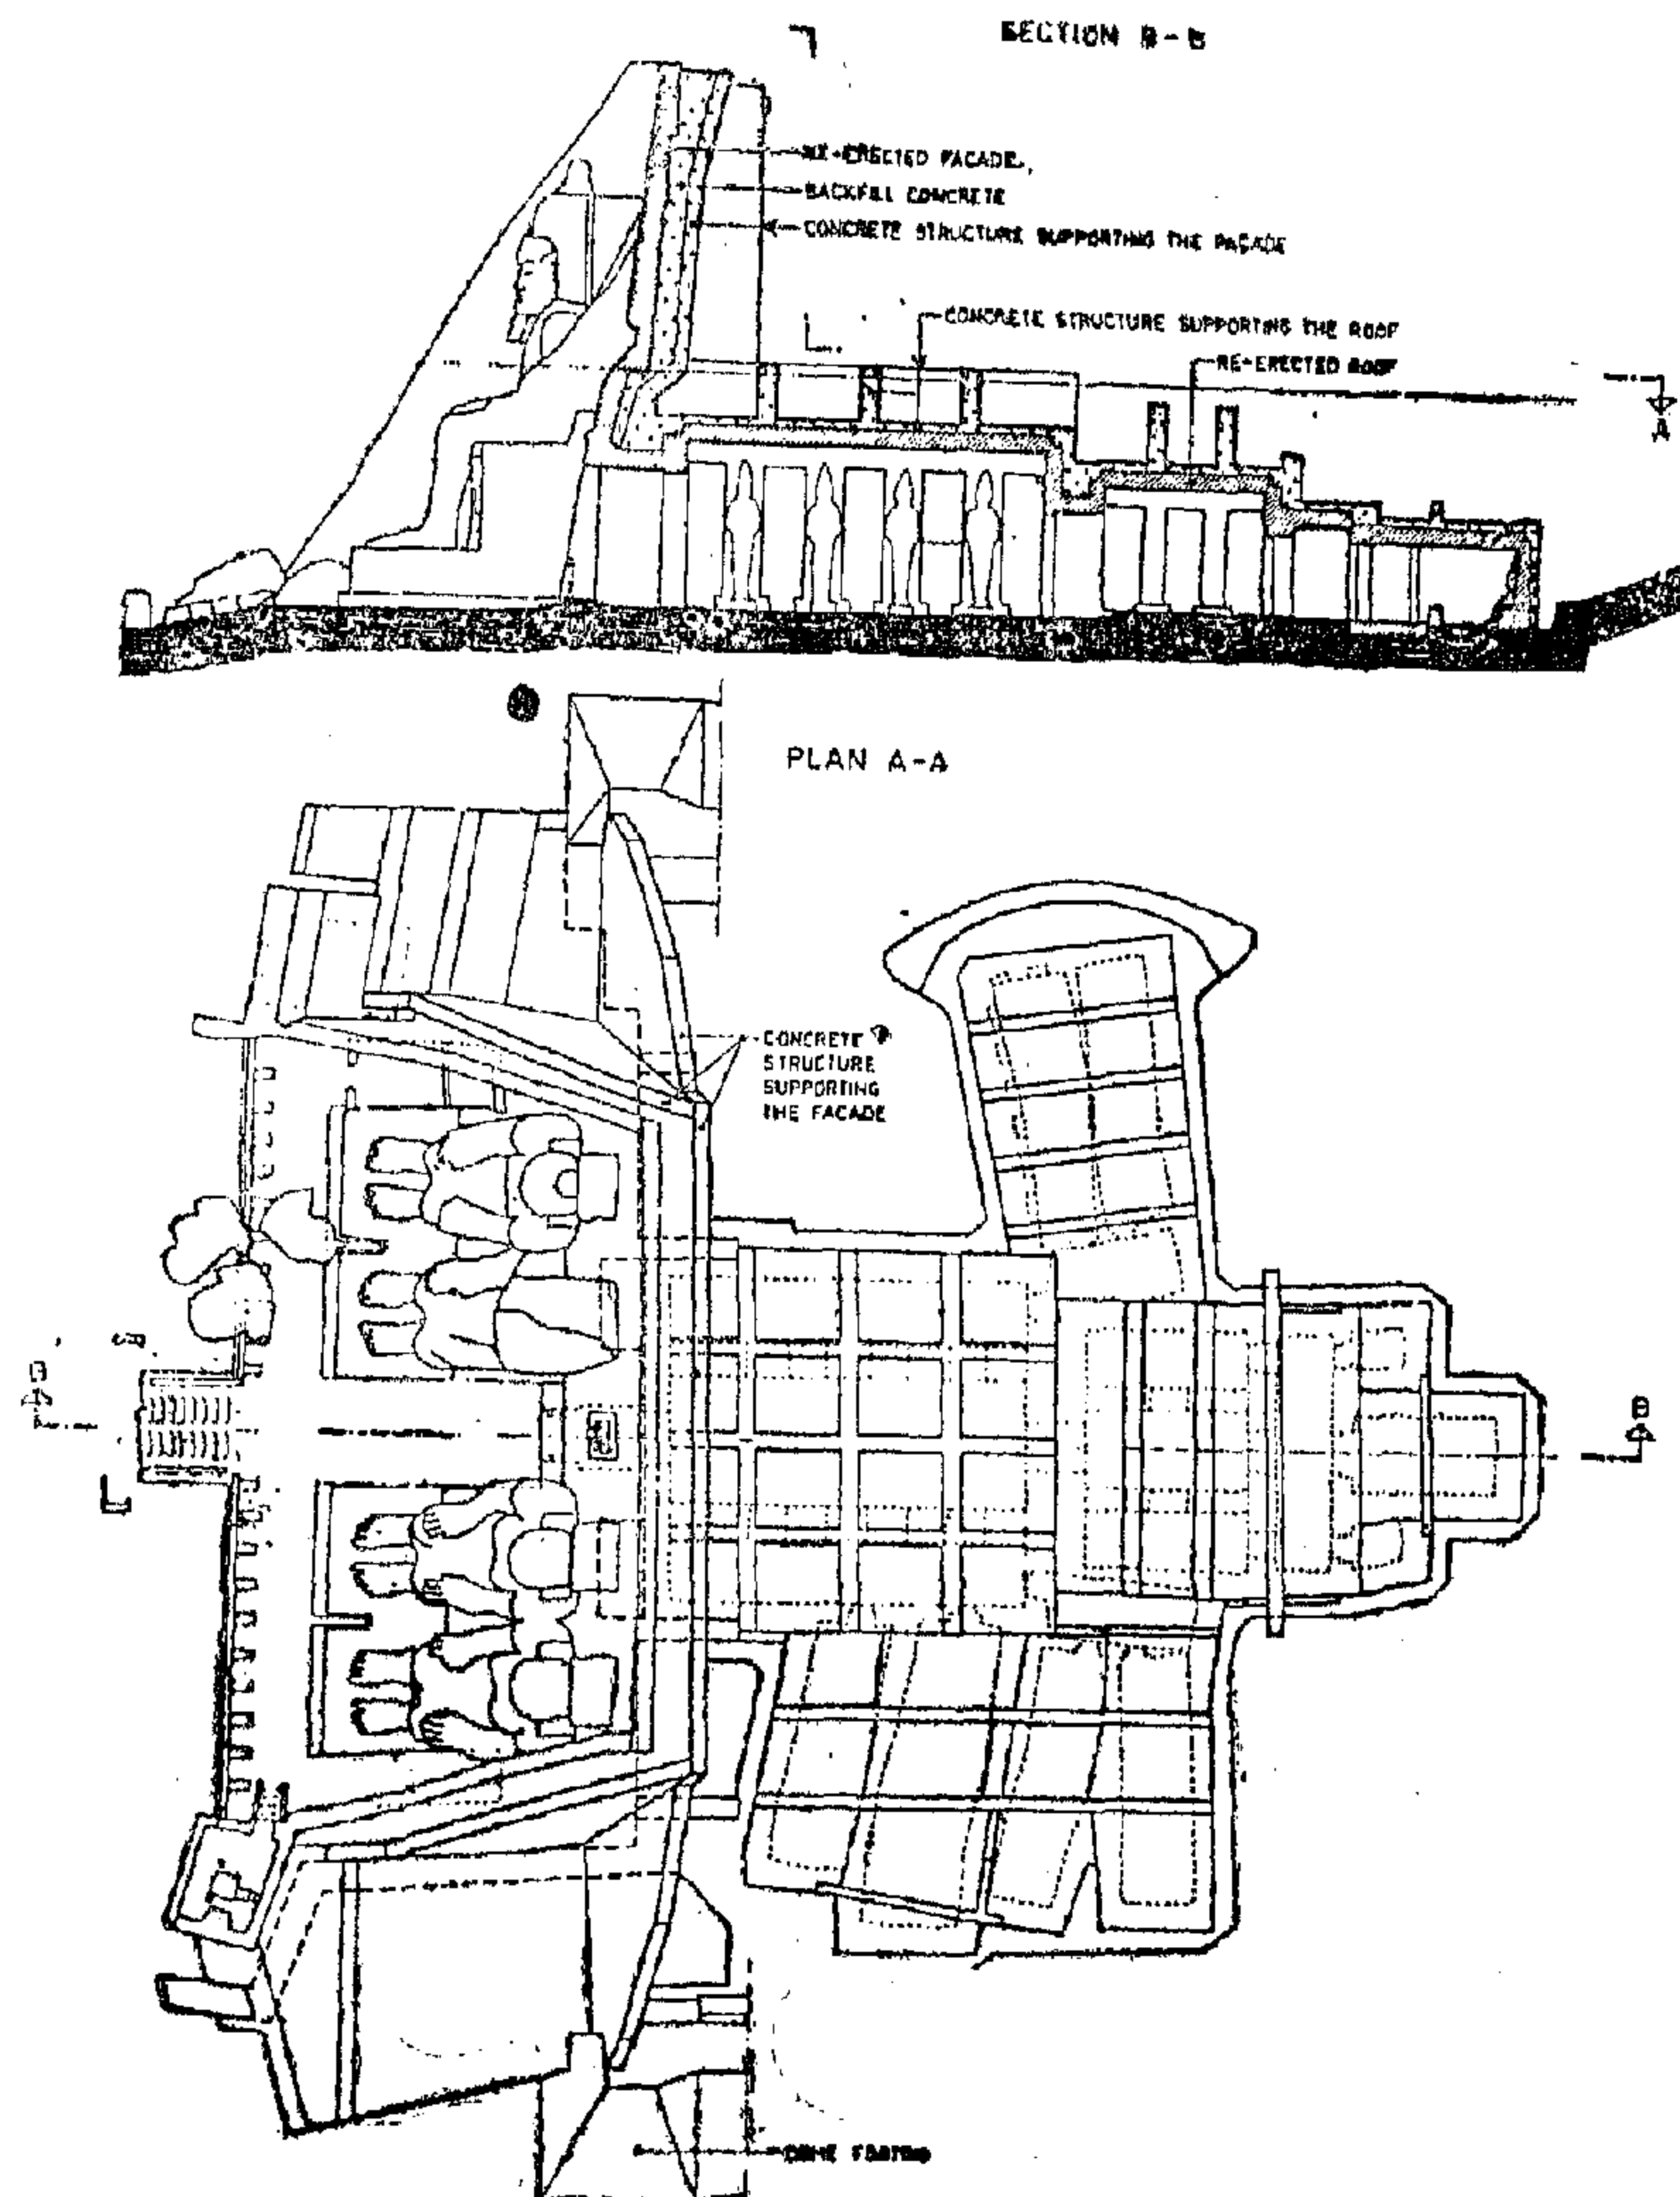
Plan and section of the Great Temple as rebuilt, showing the concrete structure supporting the temple blocks.
